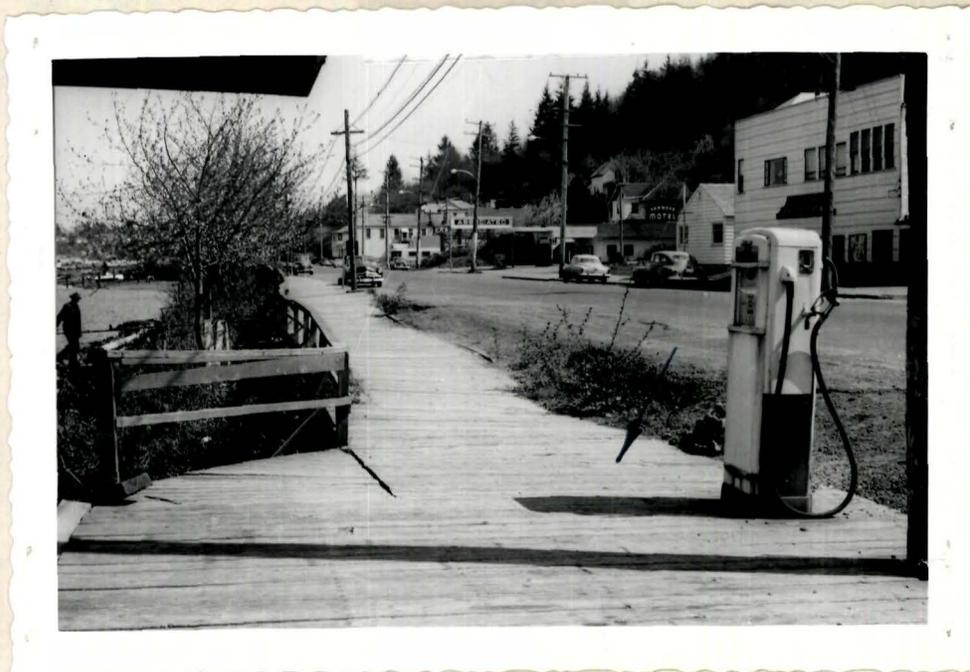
Settlement of wooden sidewalk out beyond curb line,
